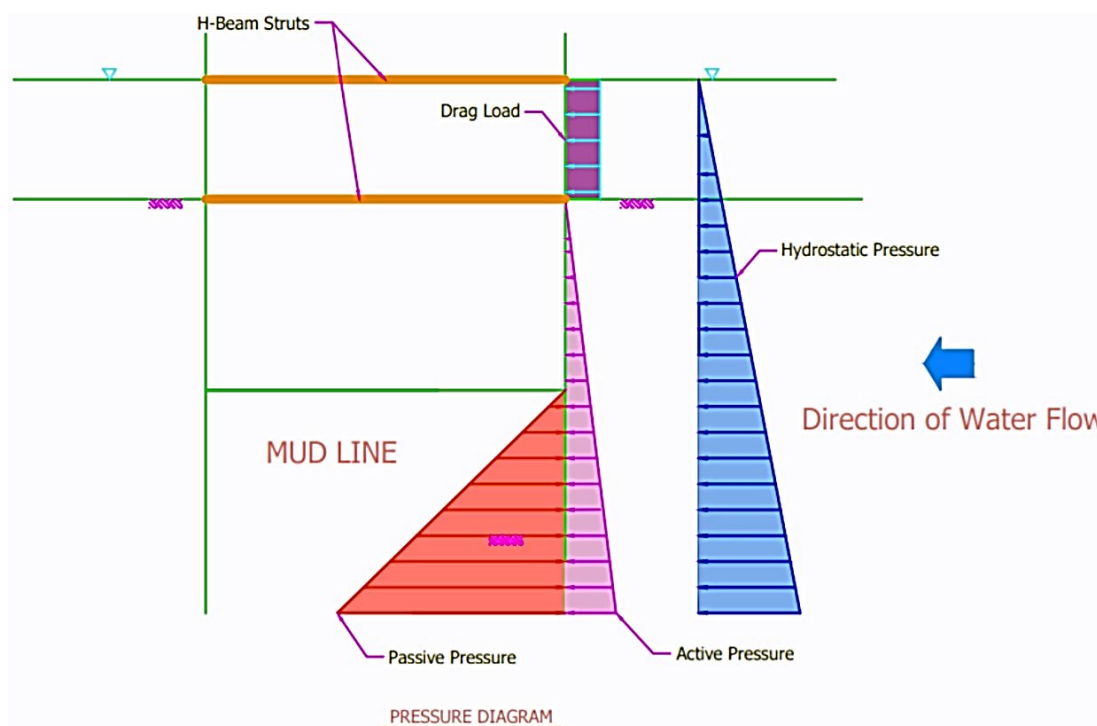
Drag and Hydraulic Forces on a Cofferdam
